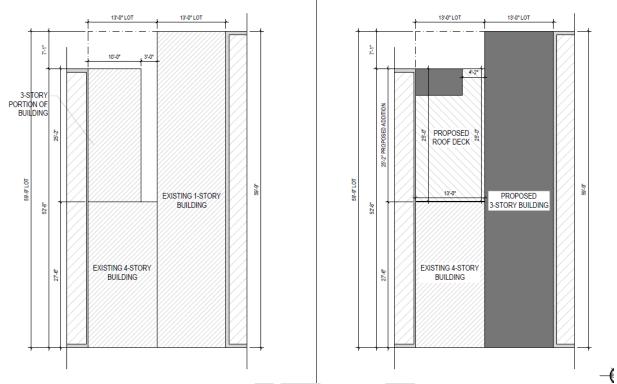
46-48 S. Carrollton Avenue – Existing and proposed site plan
